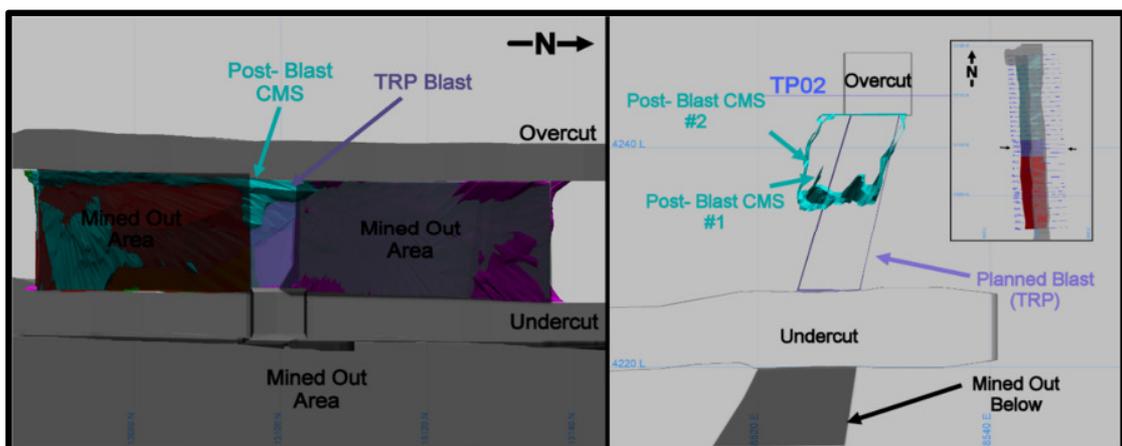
Longsection (left) and cross section (right) views of TRP WebGen™ blast CMS
